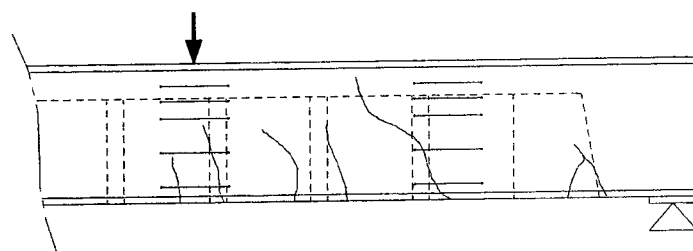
Cracking Growth of *Girder 1 West
